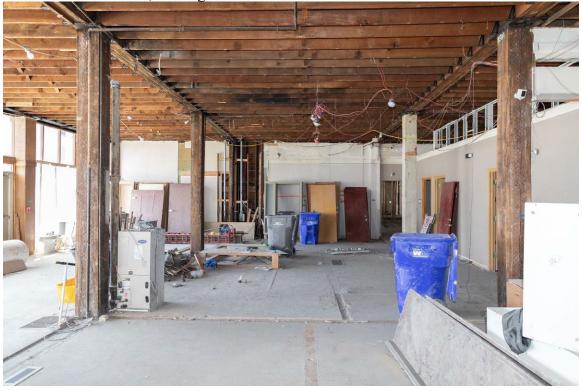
First floor, looking southeast towards the alley entrance (left doorway) and
